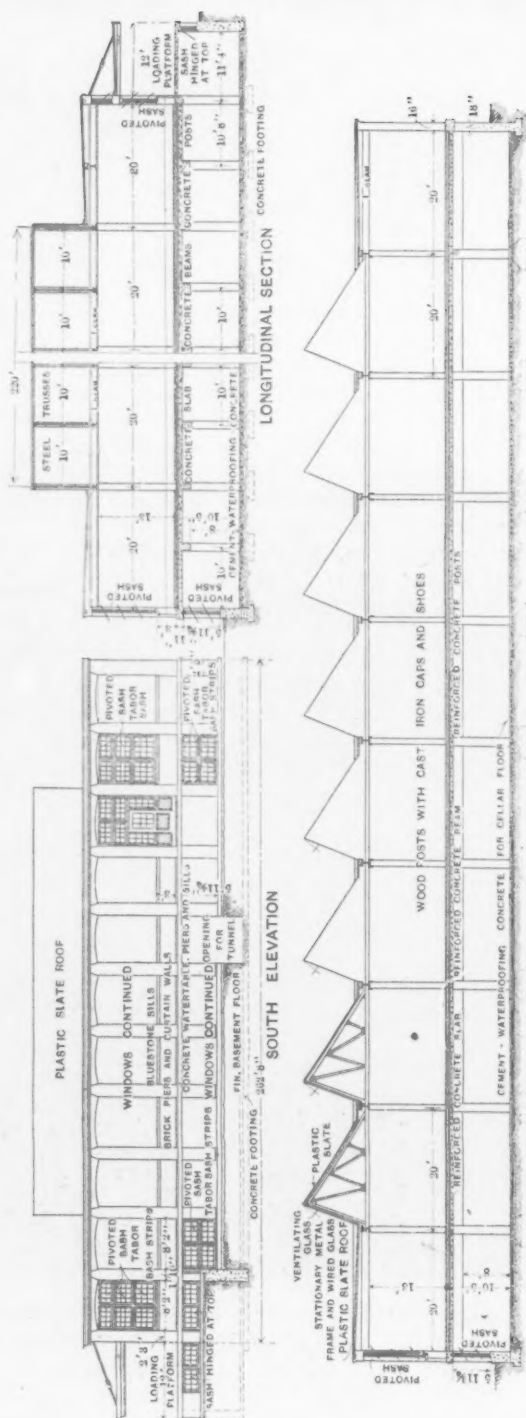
Side and Longitudinal and Cross Sectional Elevations of the New Blake & Johnson Factory.
